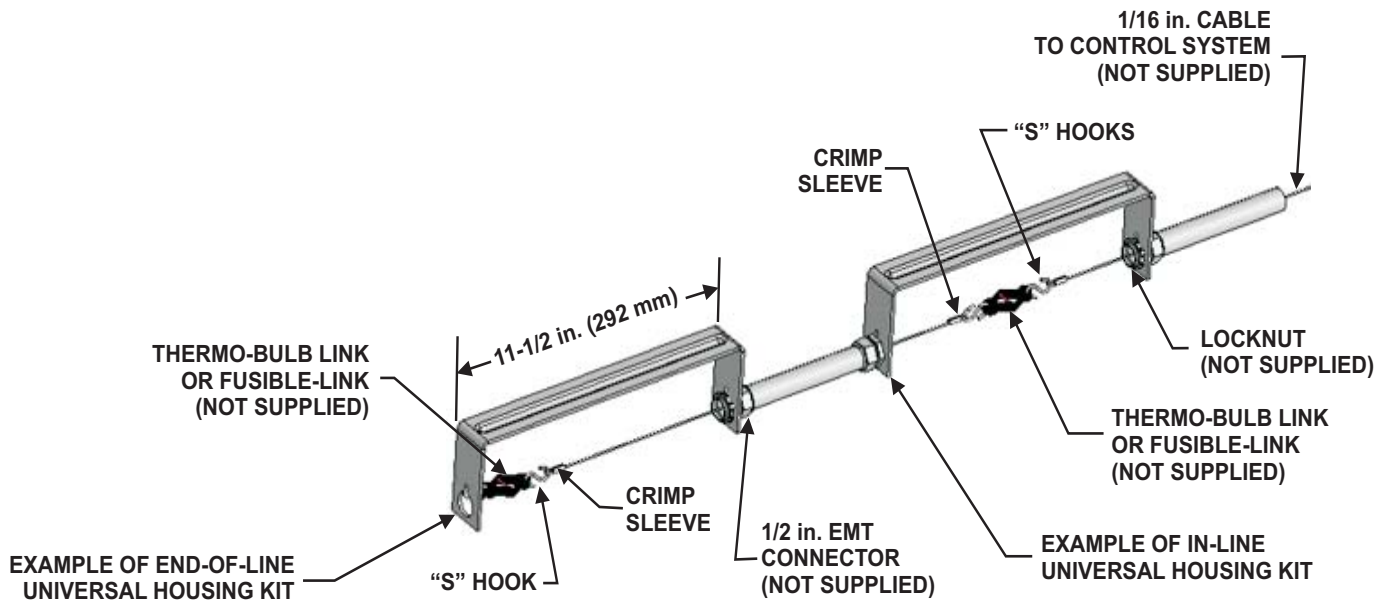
Universal-Link Housing Kit, P/N 87-120064-001
